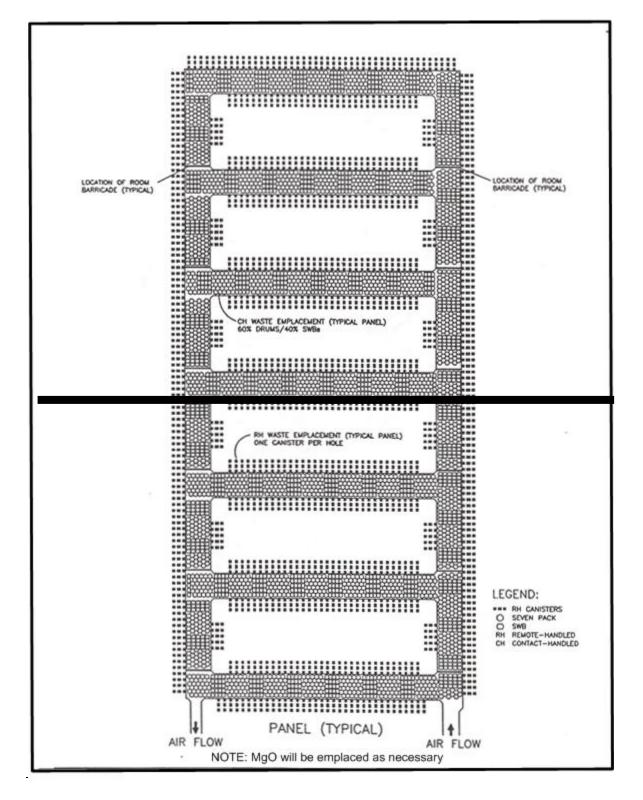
Typical RH and CH Transuranic Mixed Waste Container Disposal Configuration
